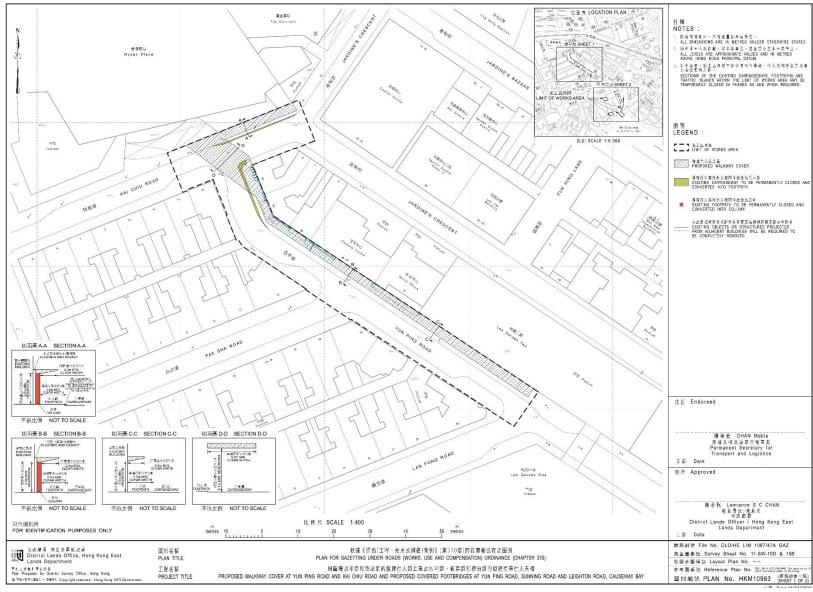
Plan showing the location of the covered walkway at Yun Ping Road and Kai Chiu Road, Causeway Bay.
